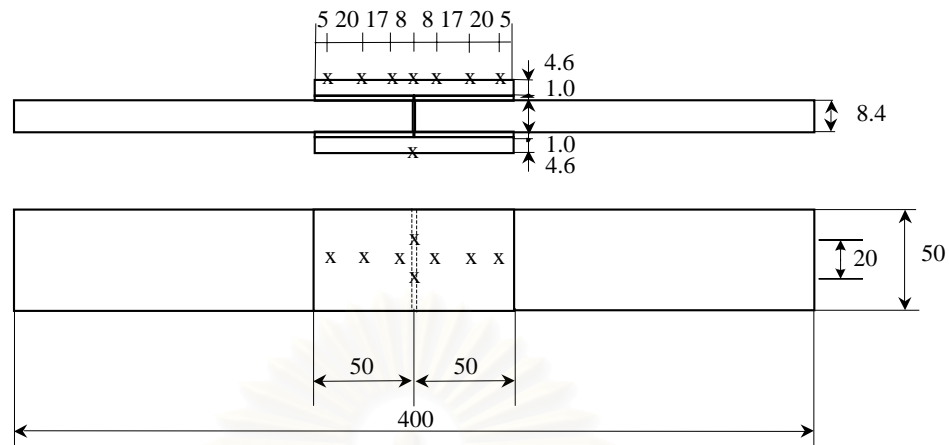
A steel only double strap joint specimen (All dimensions in mm)
